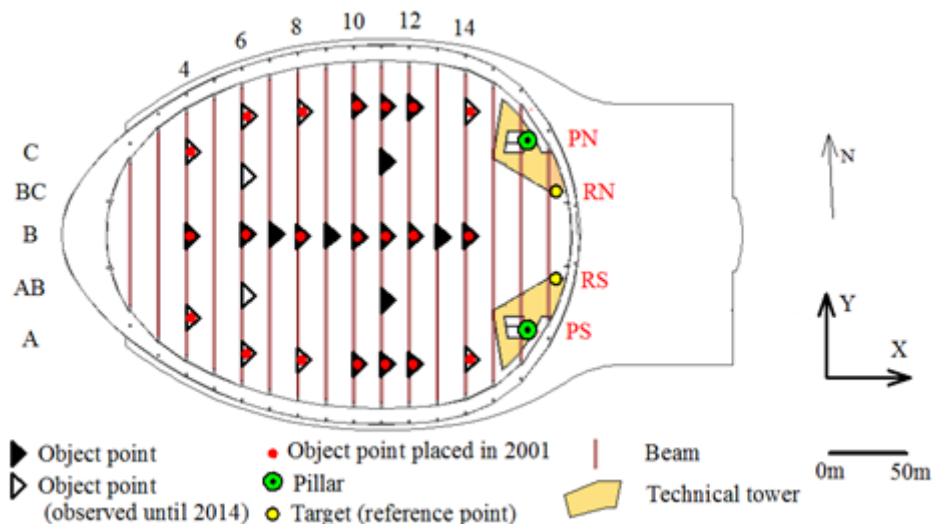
The geodetic monitoring system. Location of the points and orientation of the planimetric referential
